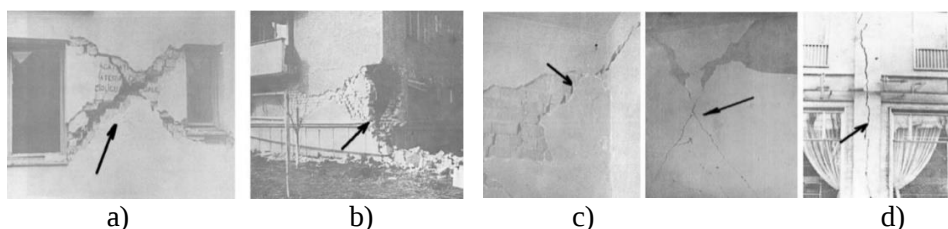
a) “X” cracks in the masonry shoulders; b) damage to exterior walls, there is a lack of concrete corner pillars; c) cracks at 45° in the masonry walls at intersections;
